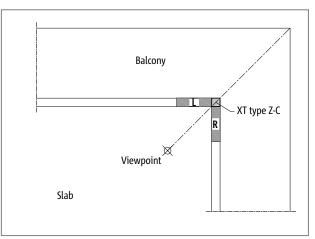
Schöck Isokorb® XT type C: Arrangement XT type C-L left from viewpoint, arrangement XT type C-R right from viewpoint
